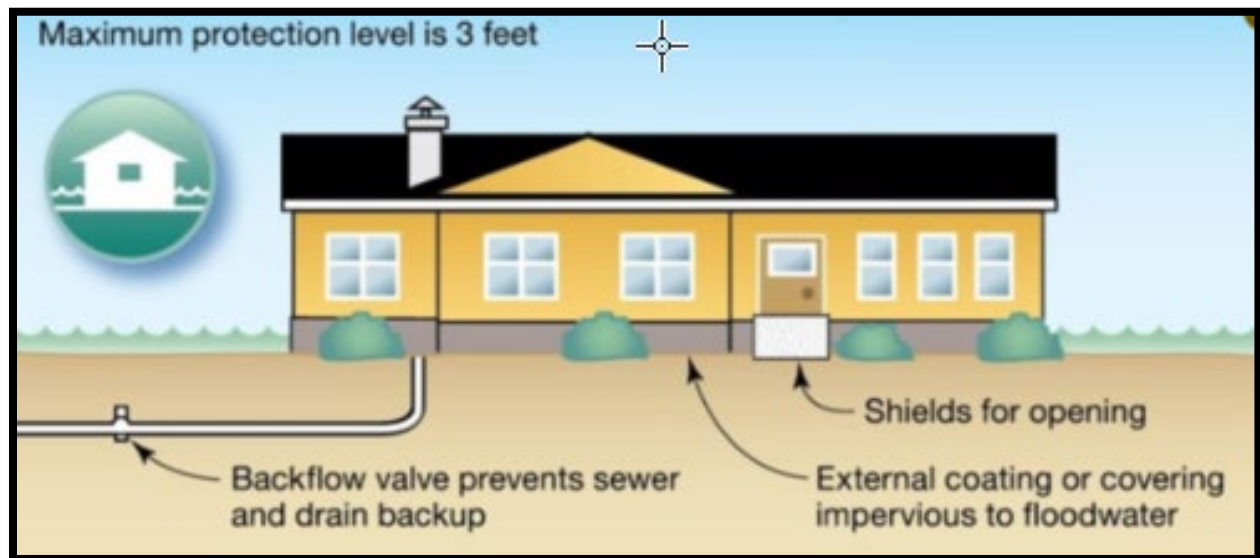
Dry Floodproofing Depiction (FEMA 551, 2007)
